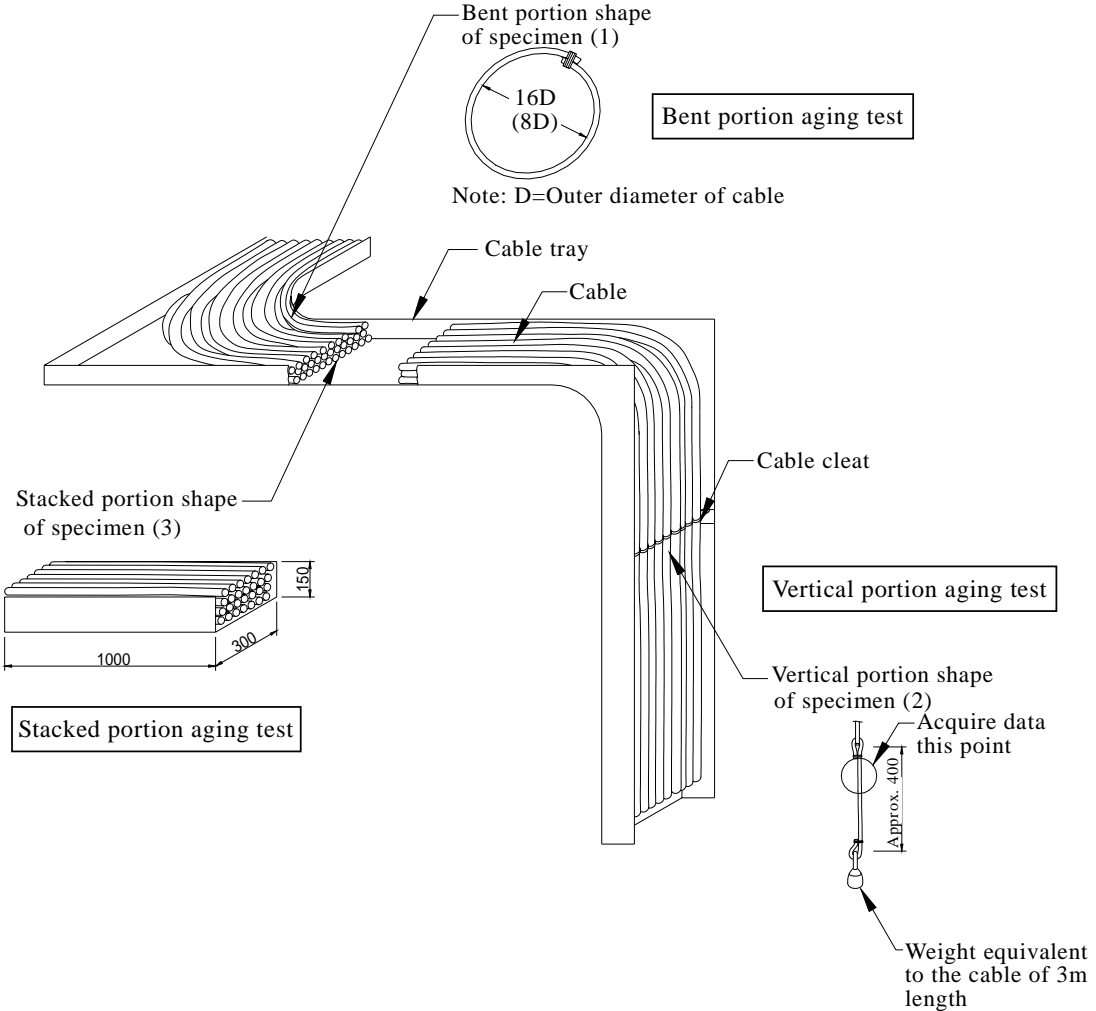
Representative cable layout in actual operating plants and specimen geometry used in tests (Unit: mm)
